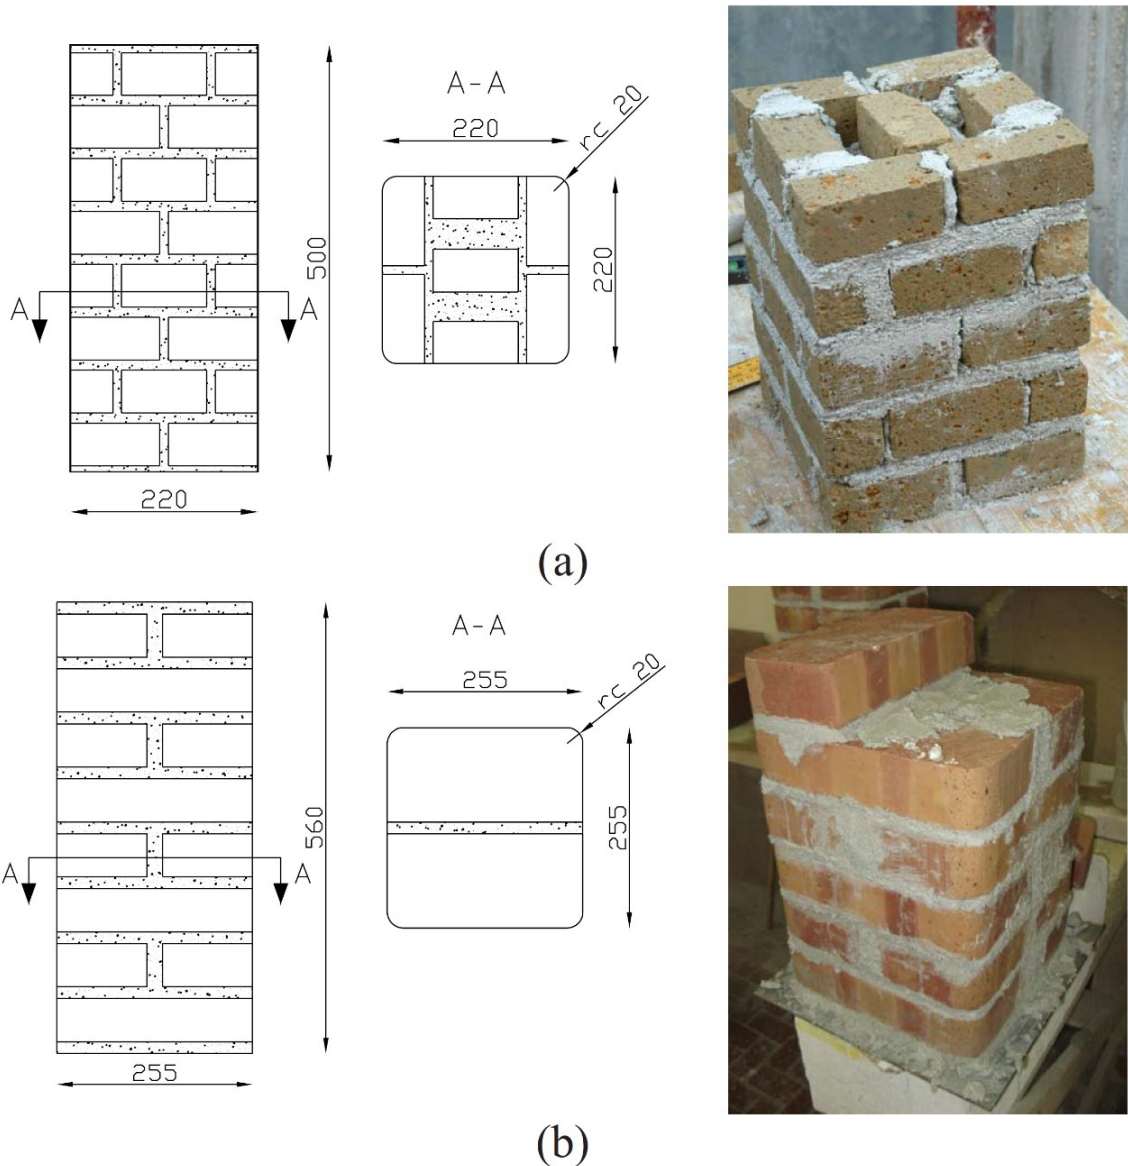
Details of tuff and clay masonry columns in millimetres (Di Ludovico et al., 2010).
